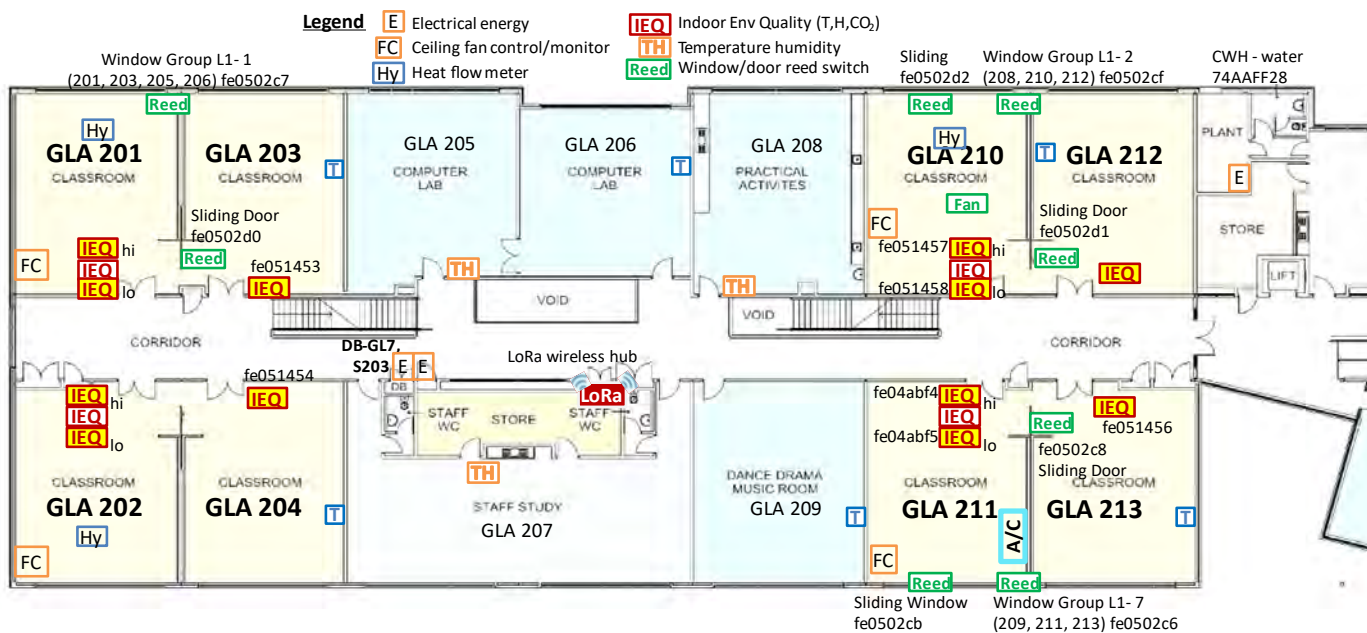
GLA Building 8 Level 2 west wing ducting and monitoring layout.
